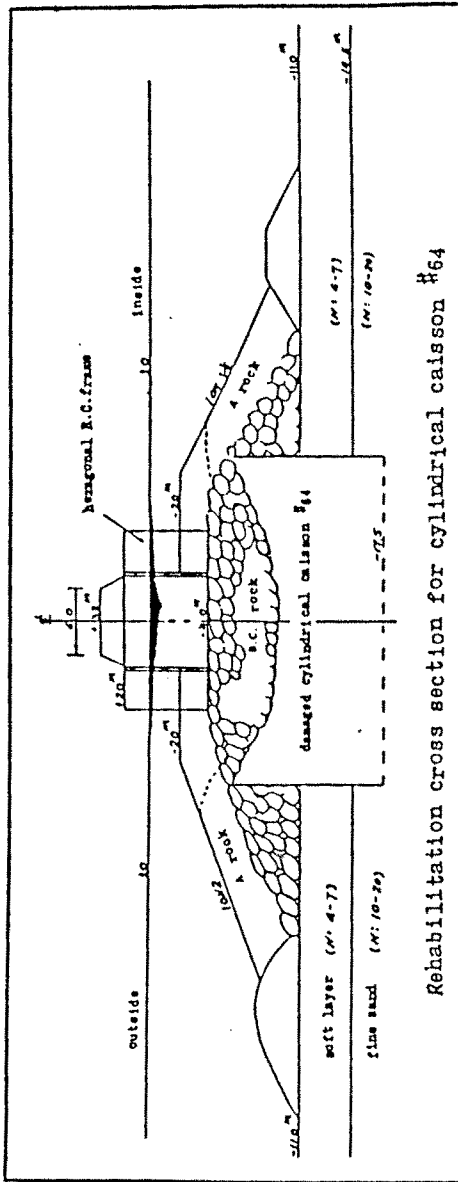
Repair method... for serious damaged cylindrical caisson breakwater
